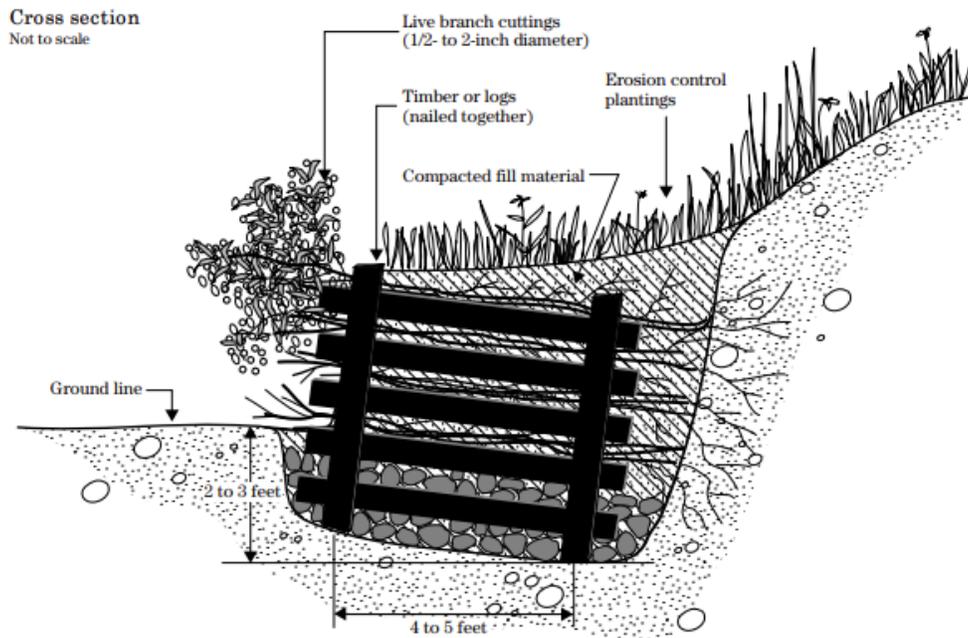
A: Live cribwall details. Source: NRCS (1996, 2021).
